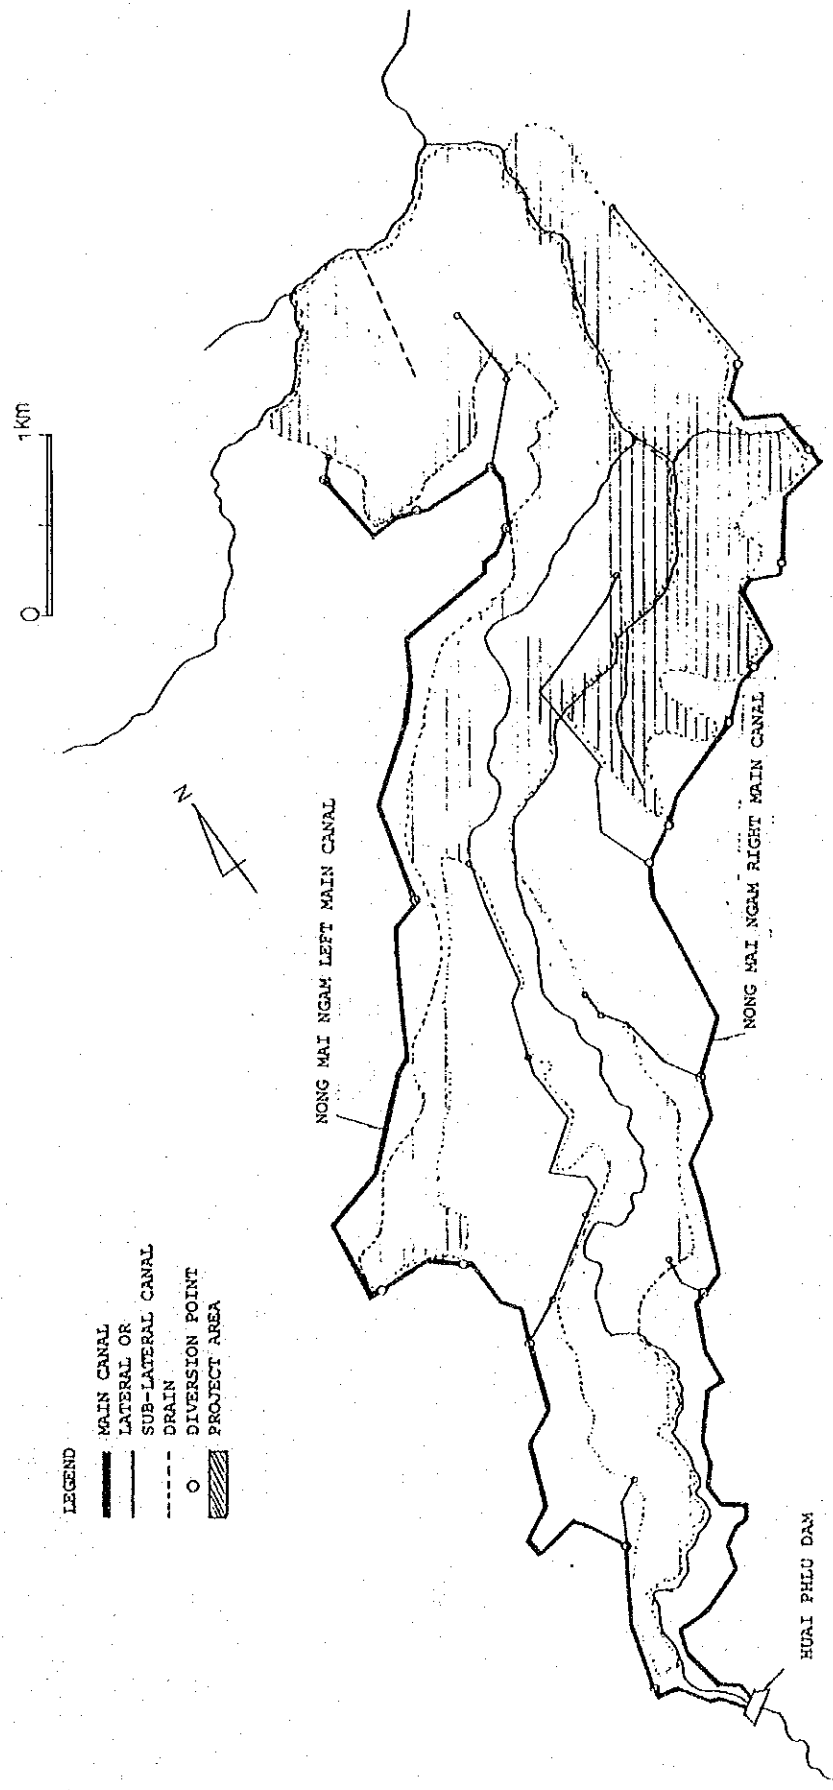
(3) CANAL LAYOUT (3/3)
